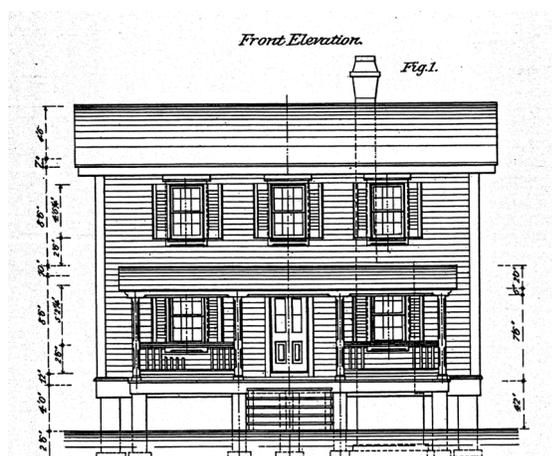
1907 design for Keeper's Dwelling, with floor plans identical to the 1886 plans. (CALO Coll.)
